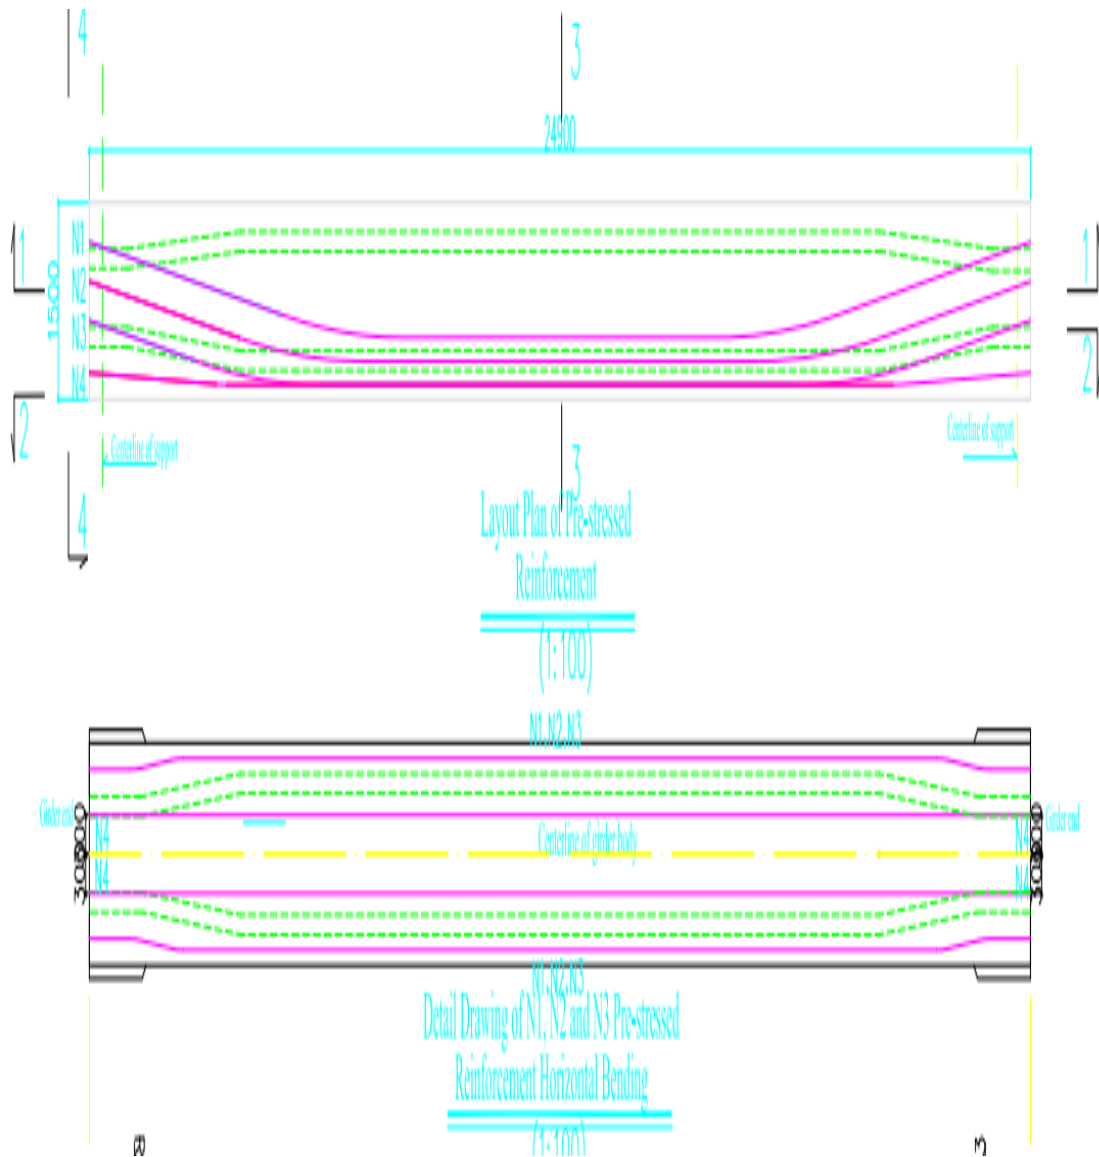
18 Geometric dimensions layout plan of pre-stressed tendons (unit: mm).
